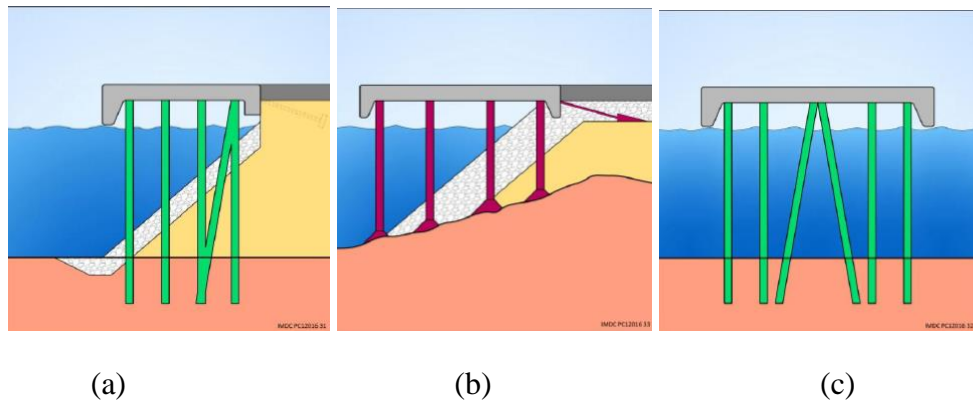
Examples of different kinds of open berth structures a) pile/column supported deck b) pile supported pier c) pile/column supported deck (PIANC [28])
